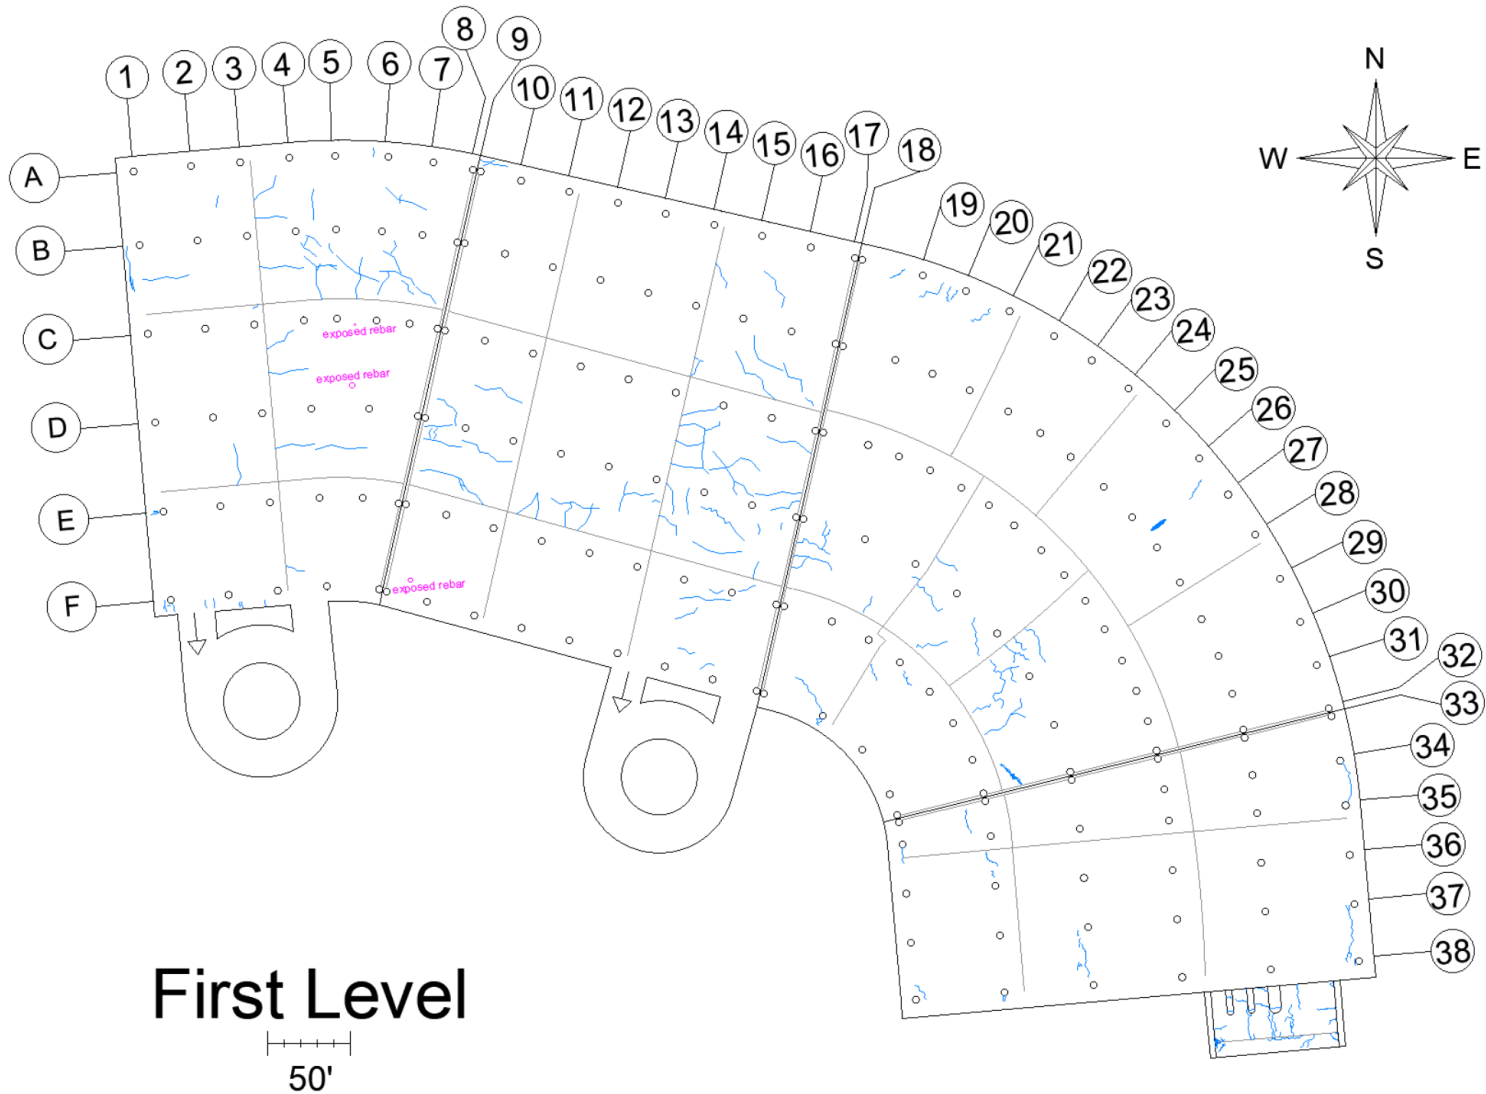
Crack map of silica fume concrete suspended, reinforced first floor and entrance bridge with blue top-down cracks, gray epoxy-filled construction joints, and locations of visually exposed rebar.
